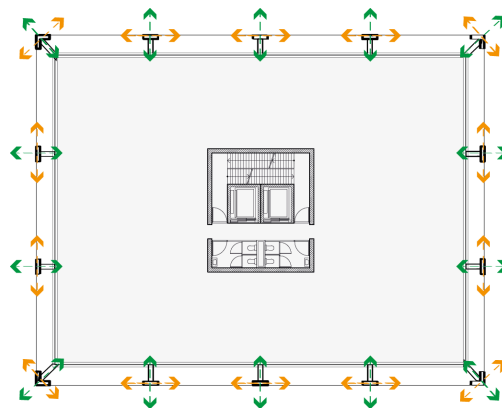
Connection with floor is considered to be of - high stiffness in direction out plane of the facade (green direction), - not high stiffness in direction in plane of the facade (orange direction)
